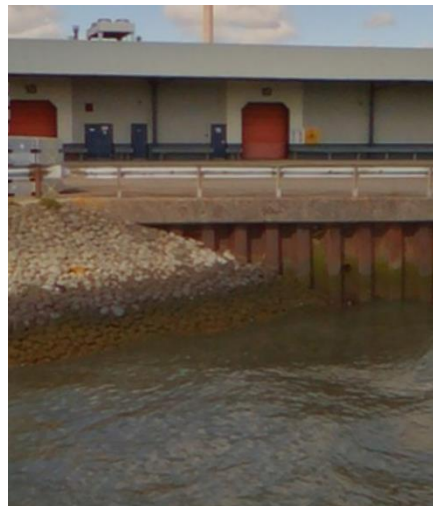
Connection between the protected slope and the sheet pile at the riverside of Pier 1
